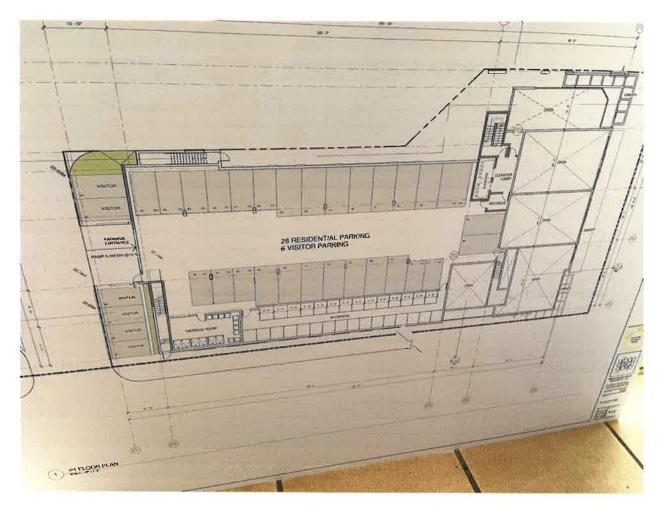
Chart showing the P1 Parking Plan with six outdoor VISITOR parking spaces.
